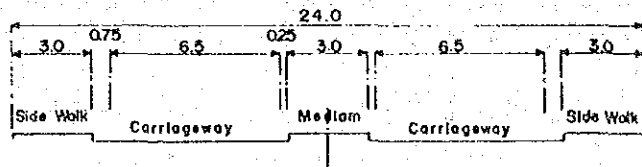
(1) Standard Cross-Section of Route 1
